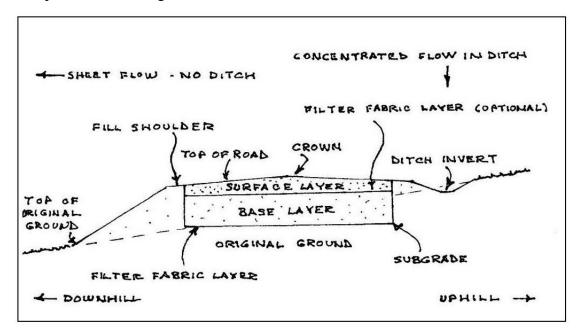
Typical Road Cross-Section - Canaan, NH Highway Department
